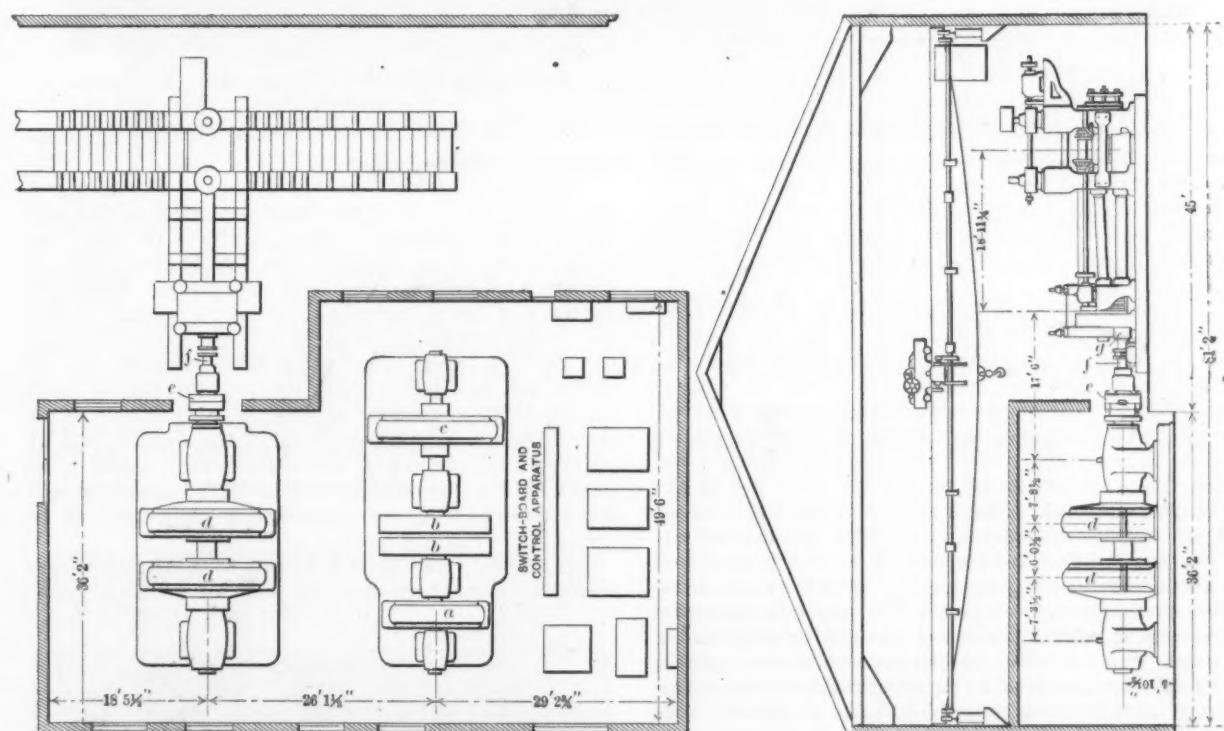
Plan and Elevation of the Electrical Equipment for the Mill Drive.
